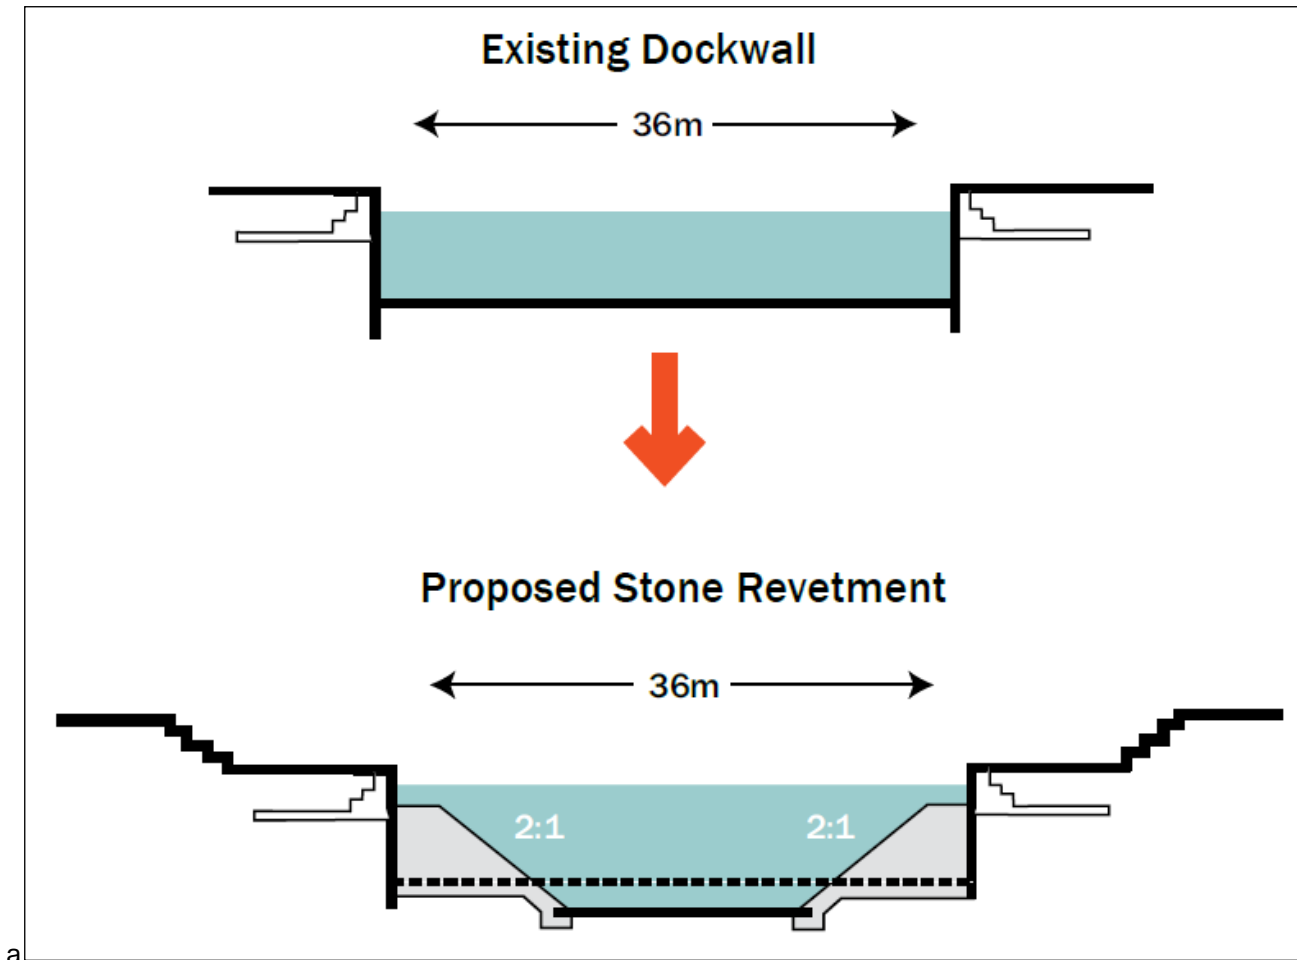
Existing Dockwall and Proposed Stone Revetment
